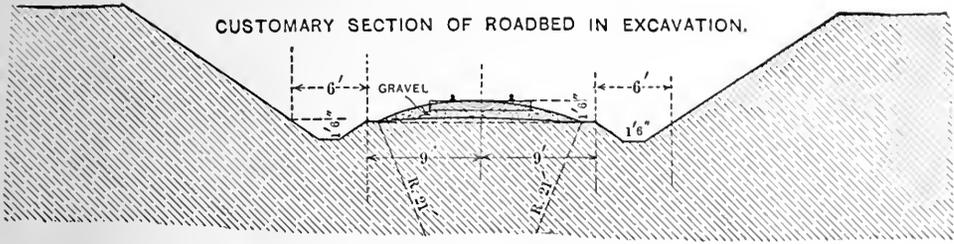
“WHITTEMORE ON RAILWAY EXCAVATION AND EMBANKMENTS,”
